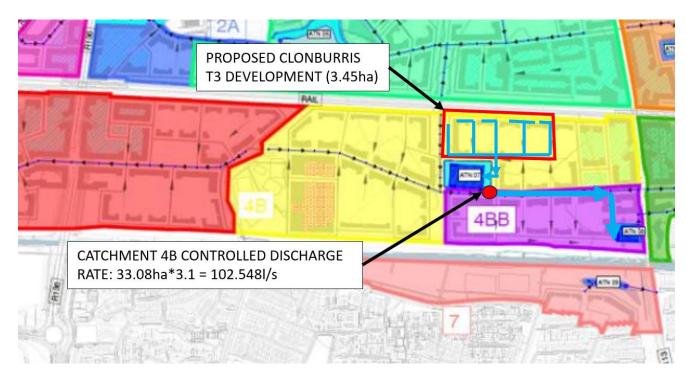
Extract from the Surface Water Management Plan Dr 190113-DBFL-SW-ST-DR-C-1101 (Catchment Plan)
